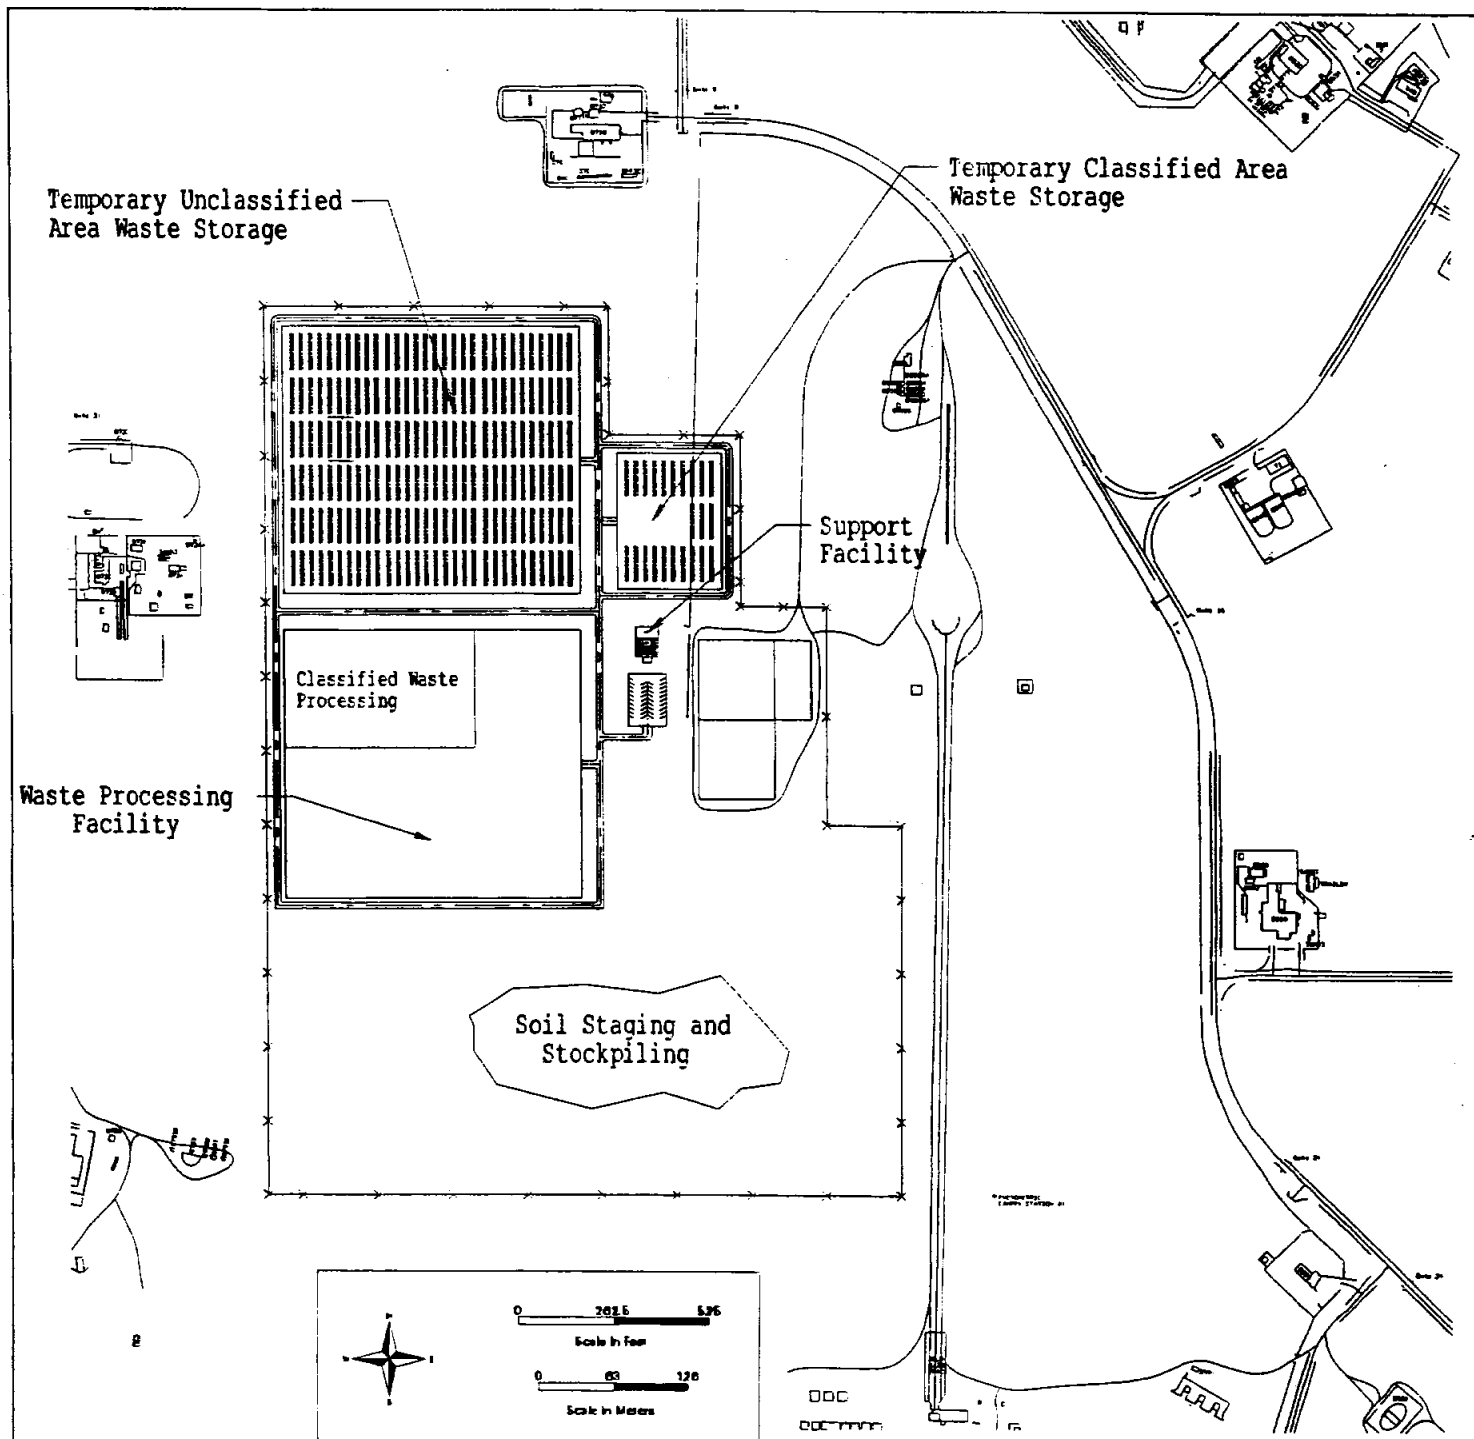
Complete Excavation with Aboveground Retrievable Storage and Backfilling
